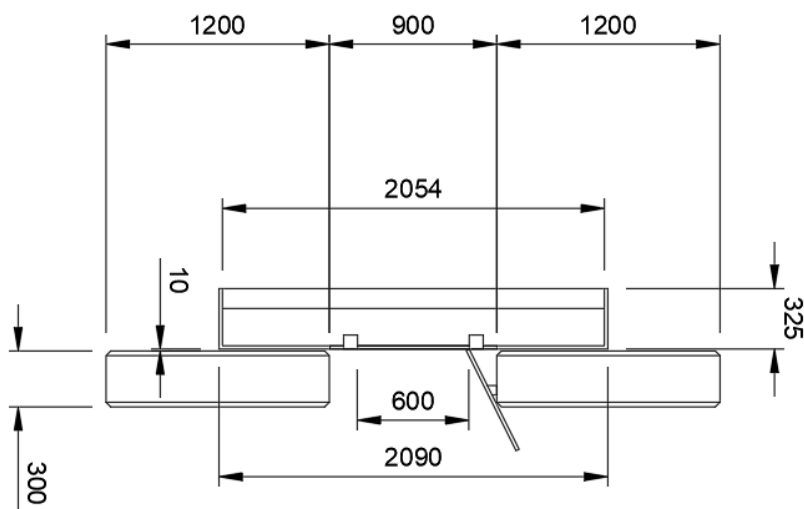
Plan view of a Nesting Cabinet in between two PC Wall Elements
